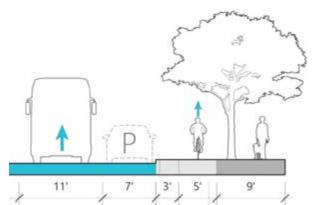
Bus on a Typical Downtown Collector Street with On-Street Parking and a One-Way, Sidewalk-Level Class IV Bikeway.
